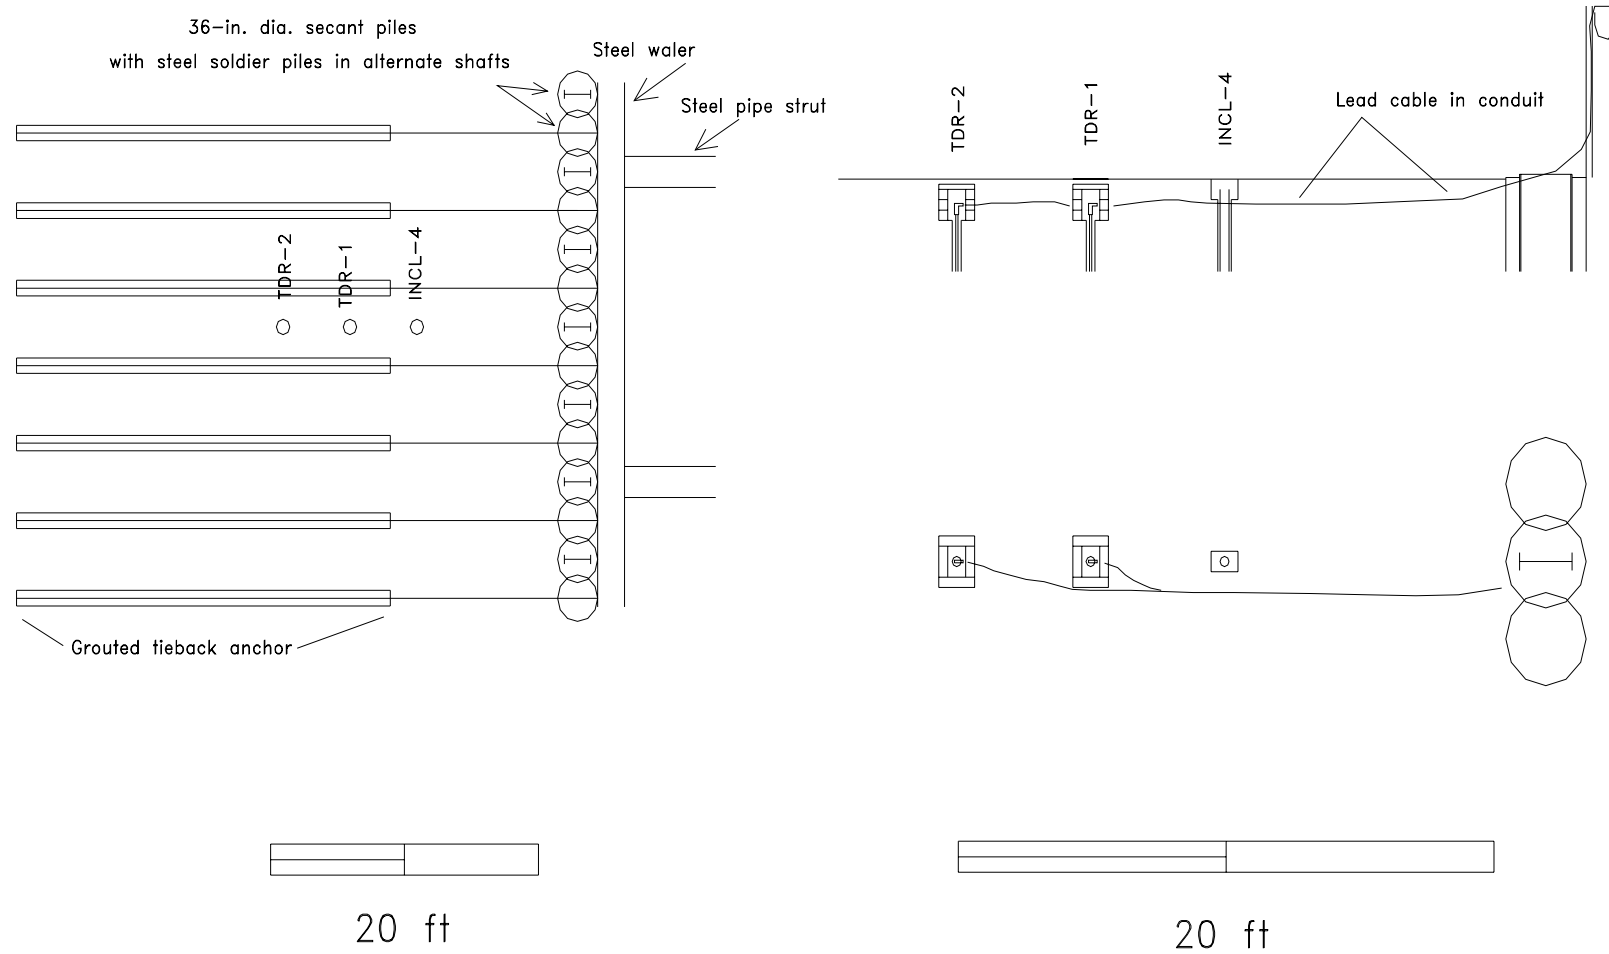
Plan view of the supporting system and location of the TDR cables, Chicago and State subway excavation, Chicago, Illinois.
